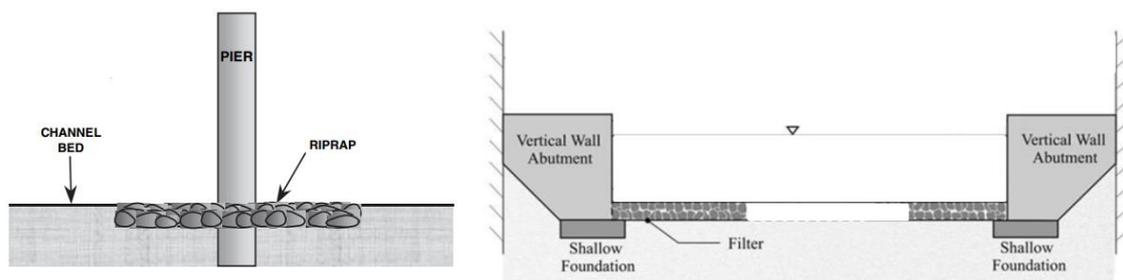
Example of a typical riprap configuration on a bridge pier (modified from Lagasse, (2007)) and riprap configuration at the abutment(modified from Suaznabar et al., (2017)).
